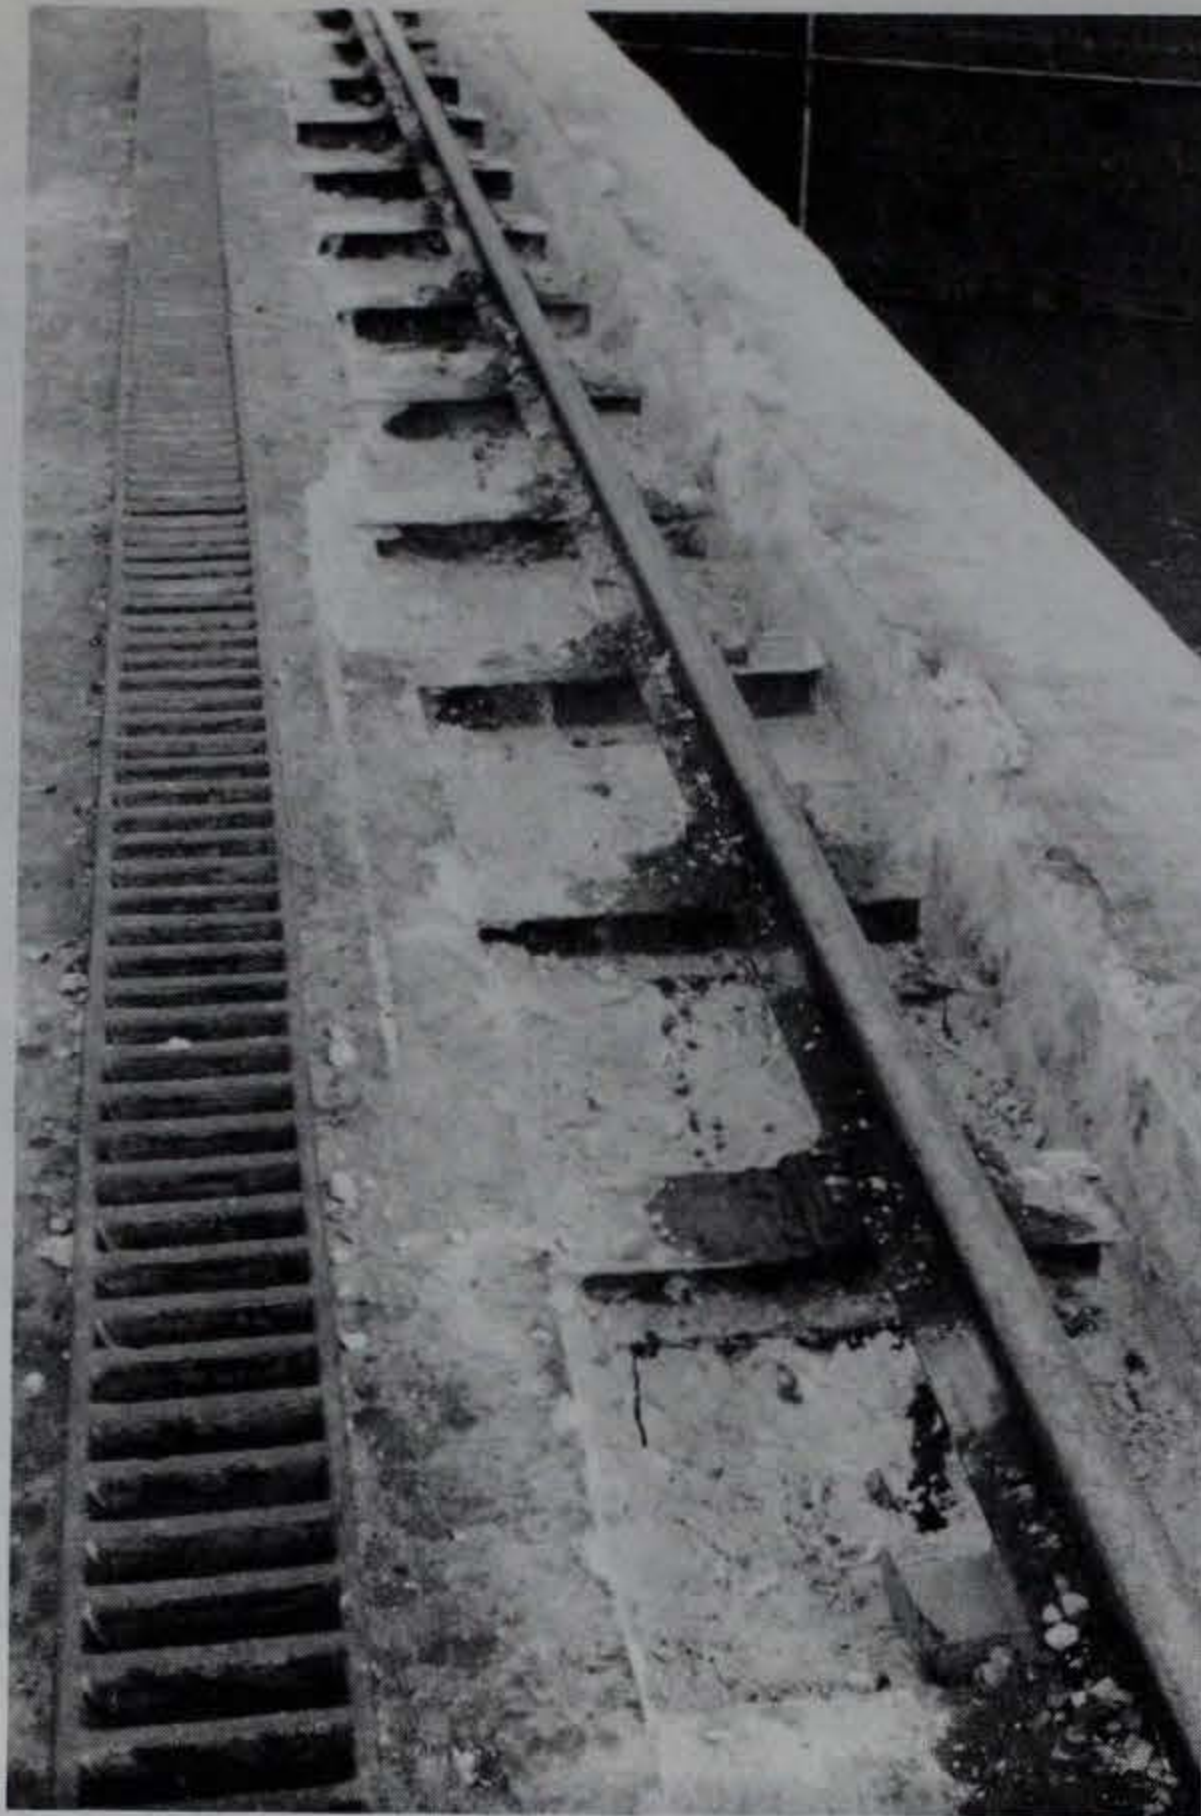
Repair area after the initial concrete excavation and removal of short ties
